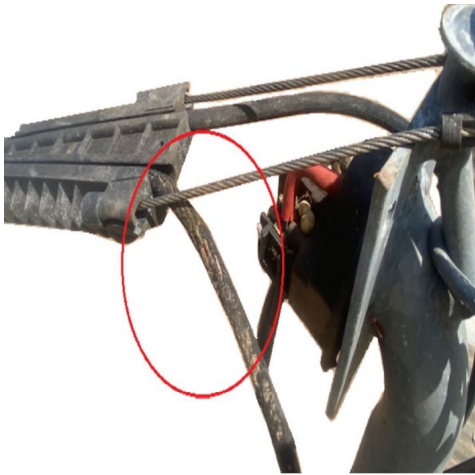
Insulation failure and direct contact between strap wire and metallic roof
